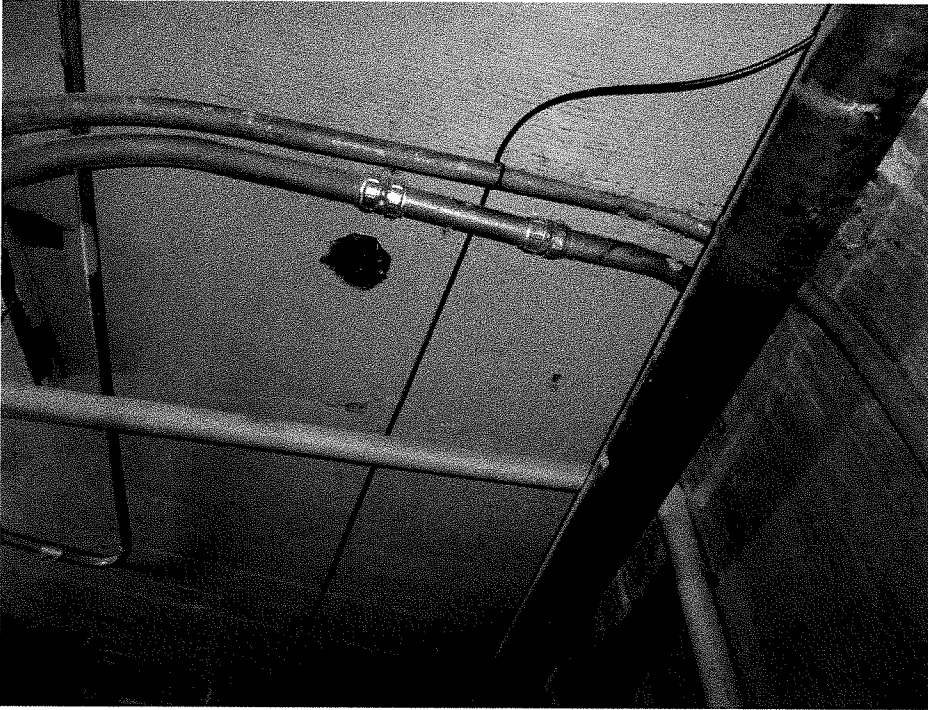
Parkade Ramp – Slab spalling below entrance ramp adjacent to east wall of mechanical room.
